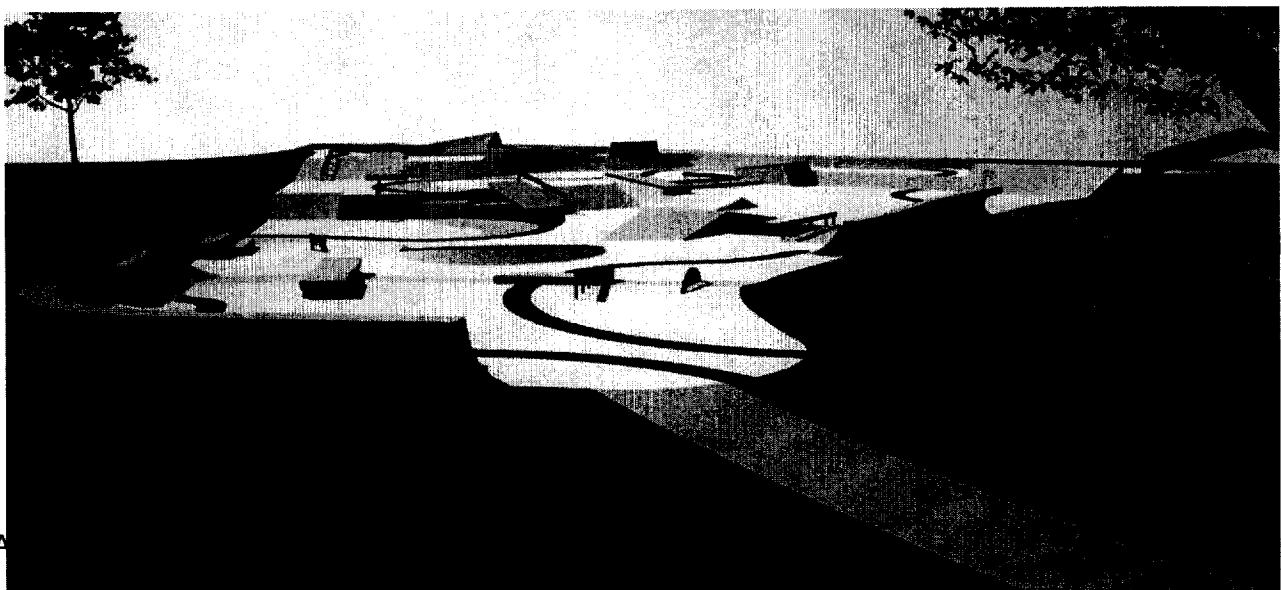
Artist's rendering of preliminary plans for the Skate Park
